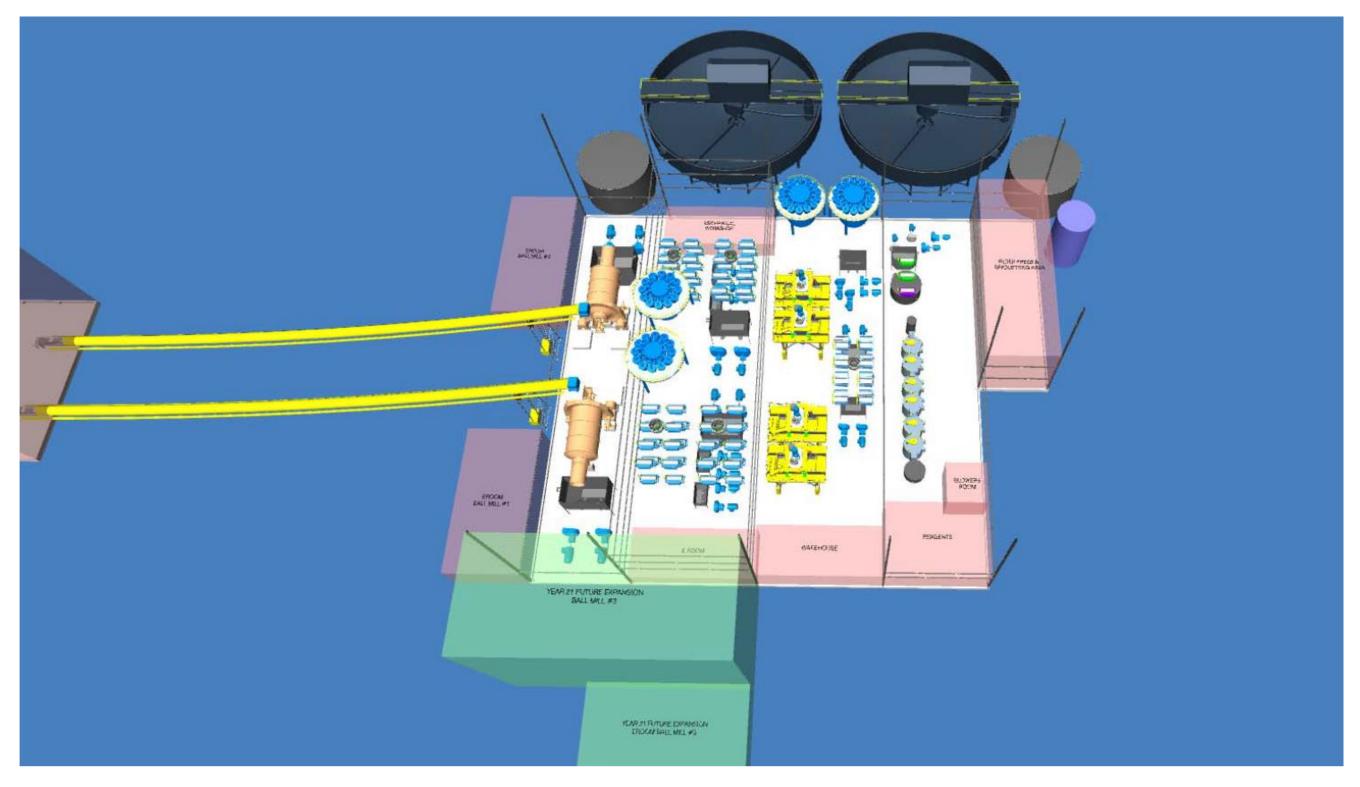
Conceptual plan view of concentrator building general arrangement
